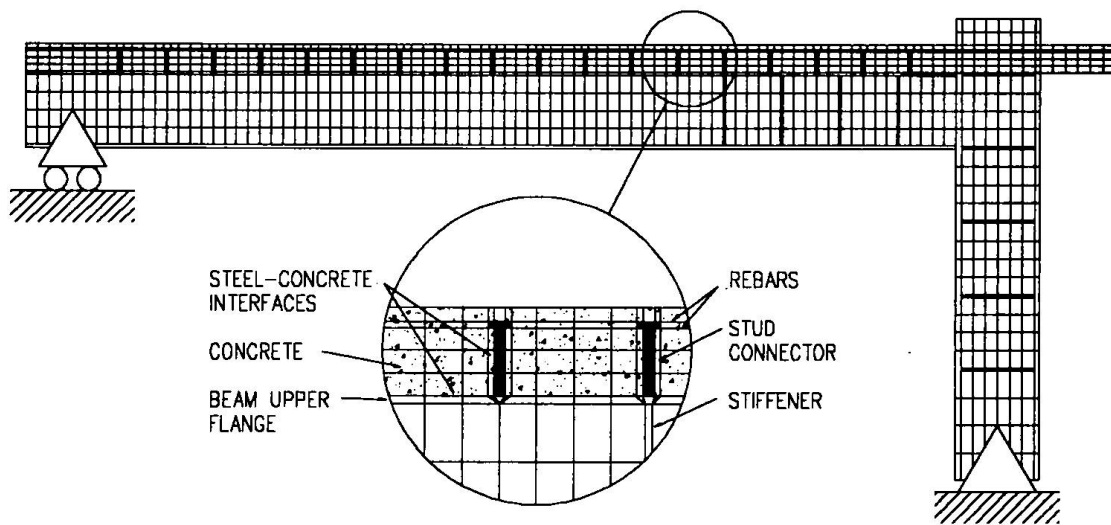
Refined two-dimensional finite element model of substructure with full shear connection
